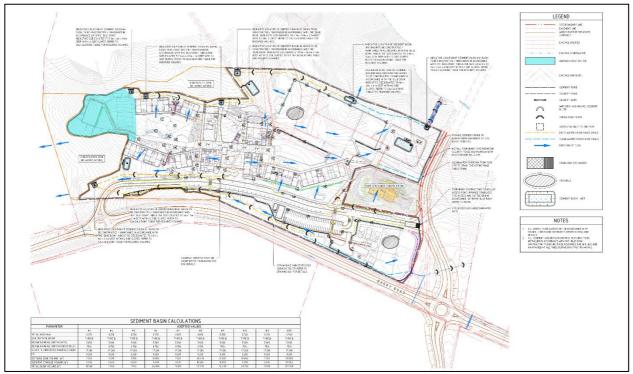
SEDIMENT AND EROSION CONTROL PLAN
